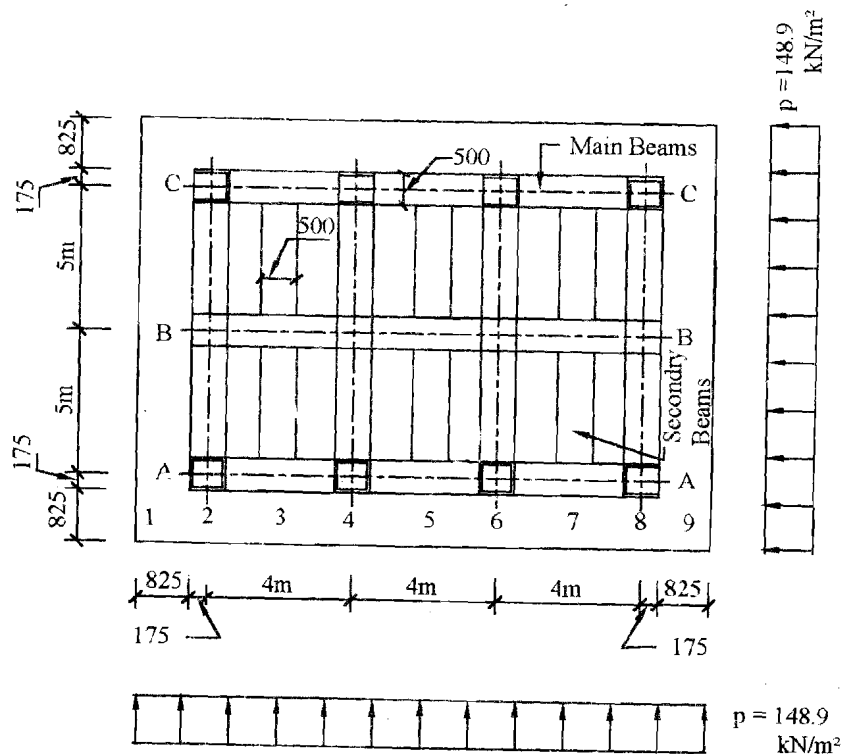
Arrangement of Beams and Pressure Diagram of the Raft Foundation
